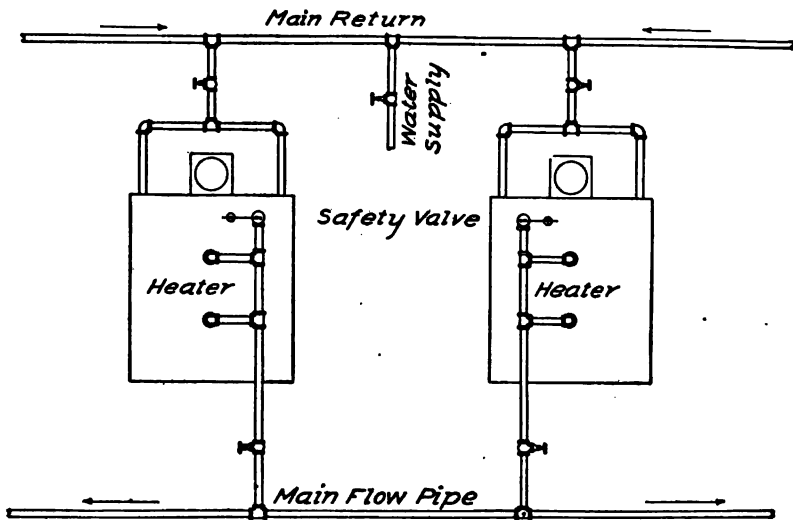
Arrangement of Valves for Two Boilers which are to Run Independently or Together.
